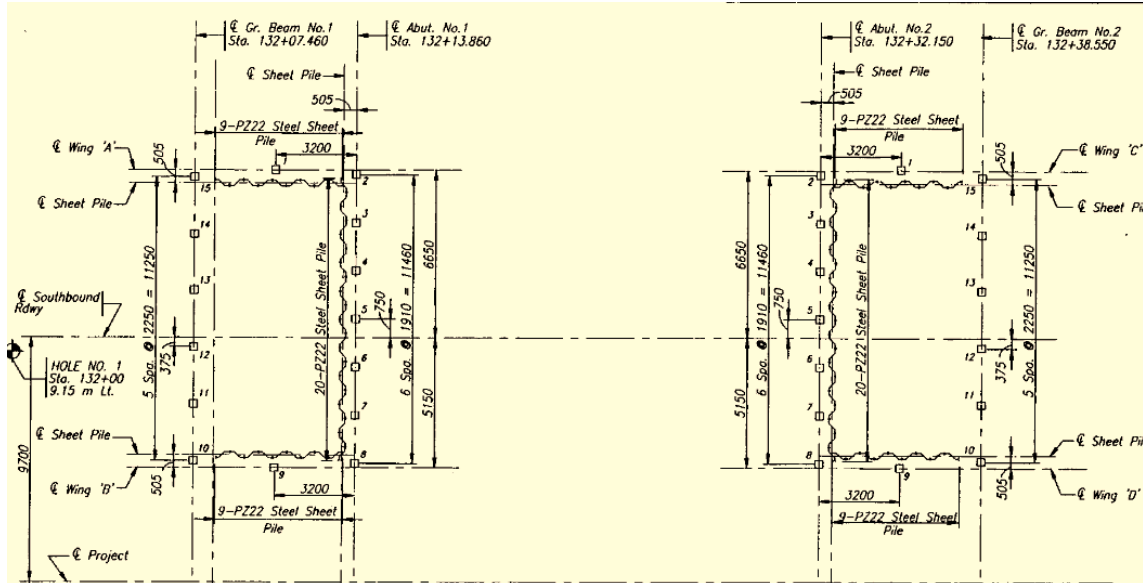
Pile Layout of the bridge in Tarnov South, Platte County, Nebraska – selected bridge site for the parametric study of the sheet pile abutment system.
